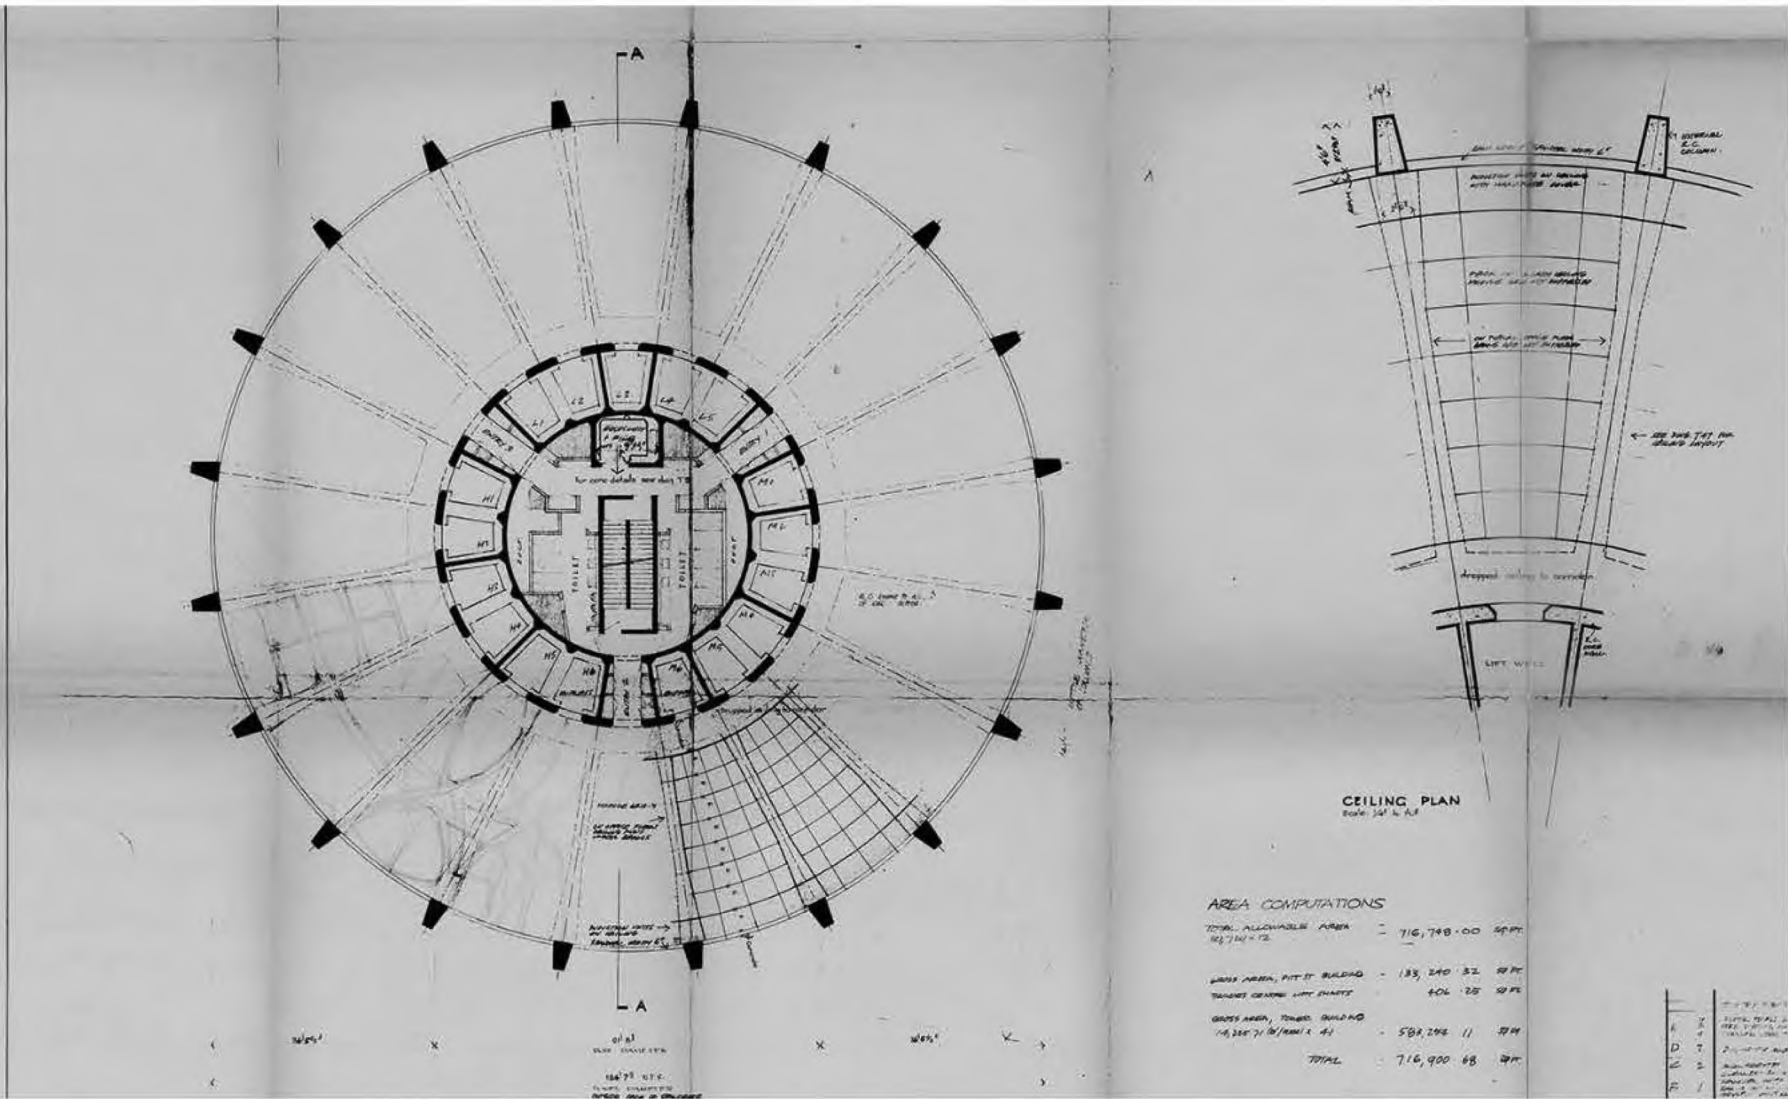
Typical floor plan (detail), Harry Seidler Associates (HSA) Series 59:10, Sydney, 1963. (MAXXI Architettura Collection. Pier Luigi Nervi Archive, Rome.)
